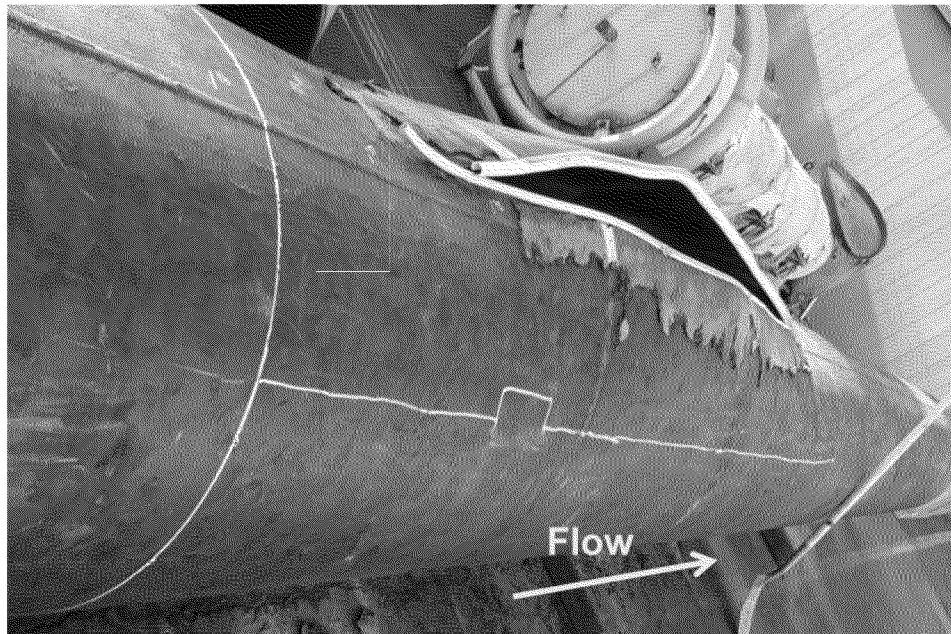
Failure Specimen, Coating Removed, Marked for Cutting (photo by author)
